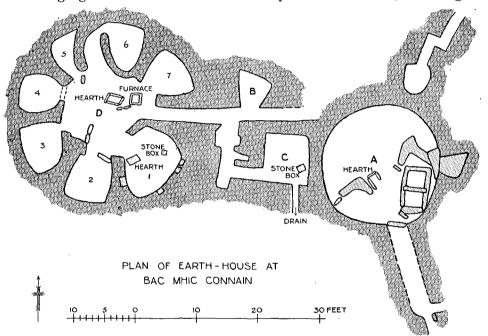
Plan of Earth-house at Bac Mhic Connain.
